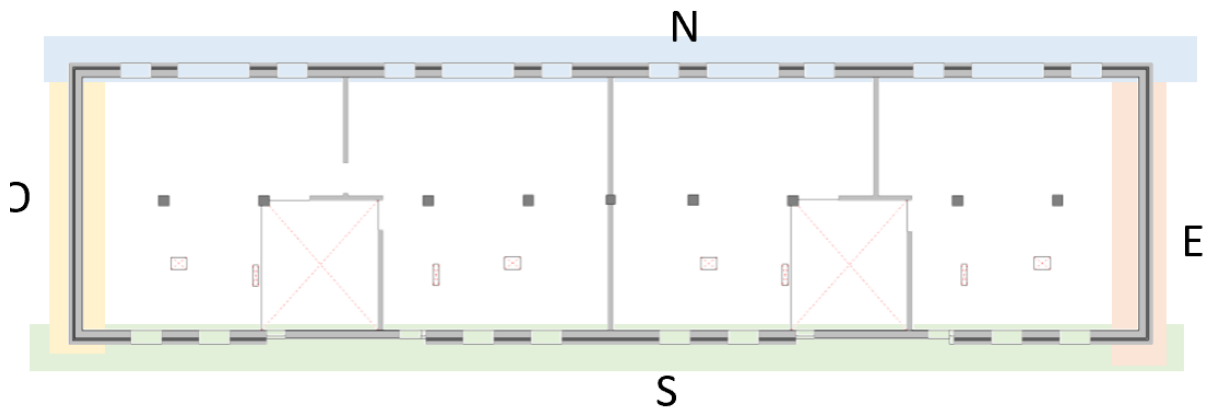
Pamplona oPEN Living Lab, San Pedro. Plan view. LOC_Ubicacion04 >> ORIENTATION, by authors, 2023. Copyright 2023 by oPEN Lab.
